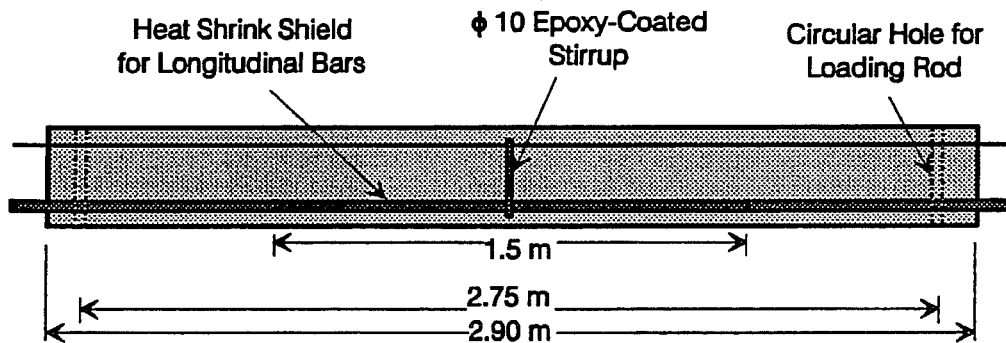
Details of Group II Beam Specimen (Stirrup) [Kahhaleh, 1994].
